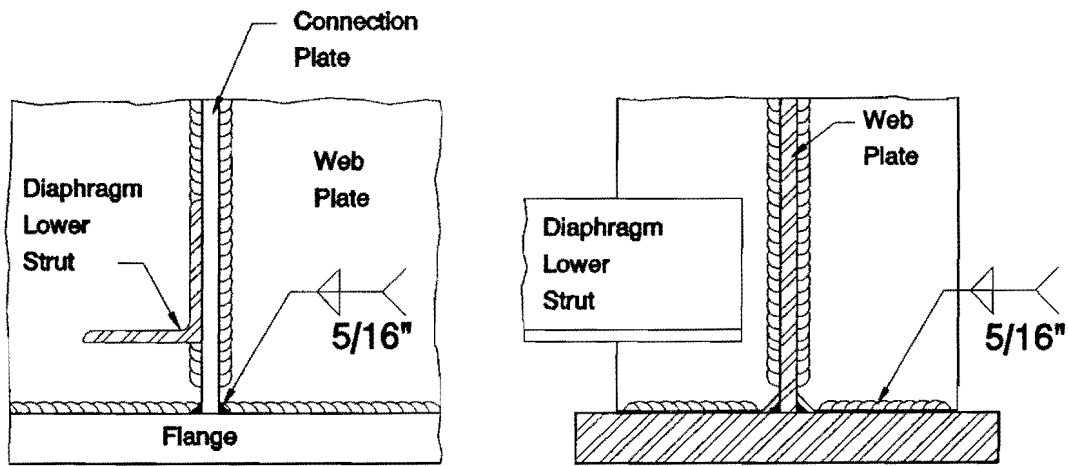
Recommended welded attachment for tight-fit connection detail.
